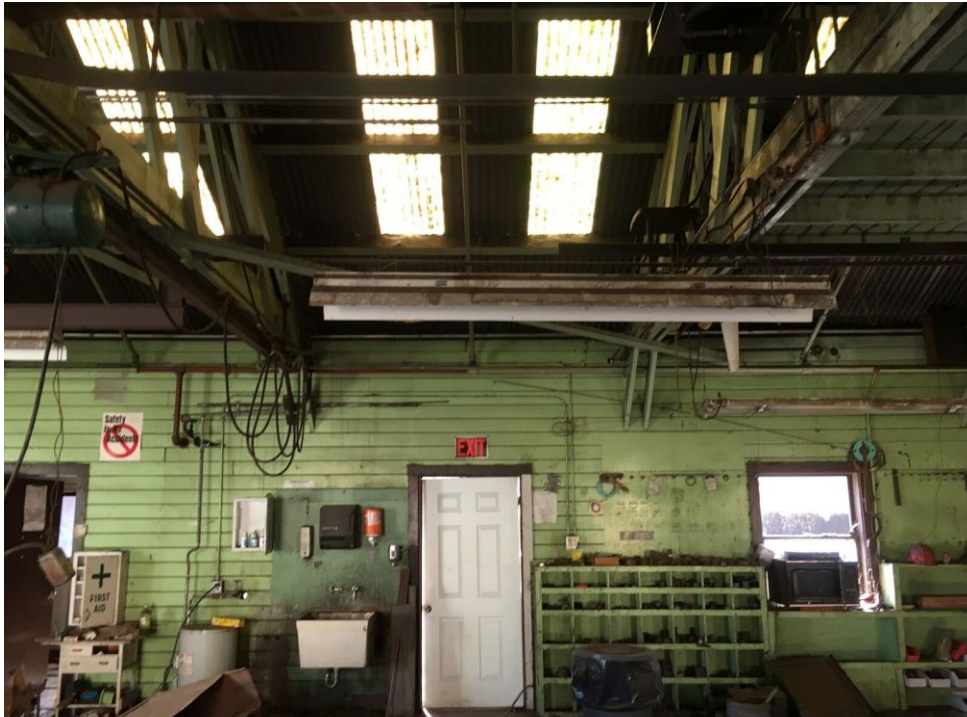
3.B typical wood door with frame and surround, sink, and wood cabinets and shelves, electrical light fixture, open ceiling, truss system and translucent panels above.
